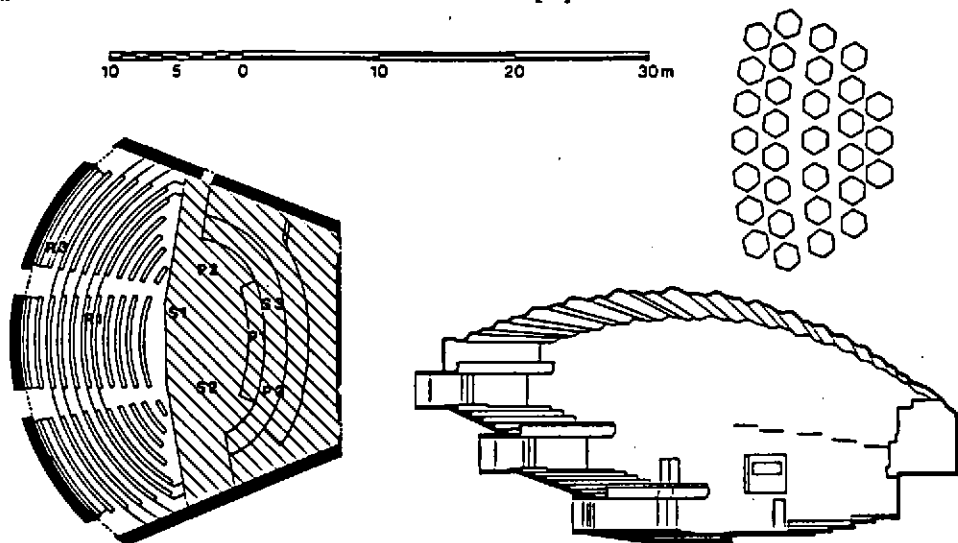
Plan and section of The Danish Radio Concert Hall showing the existing reflector array placed over the orchestra platform.
